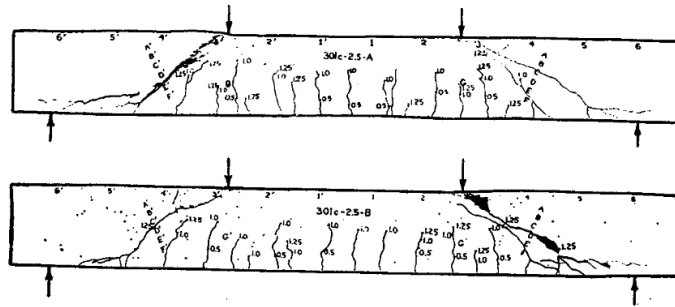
Beam failure caused by diagonal cracking reported by Kani (1964).
